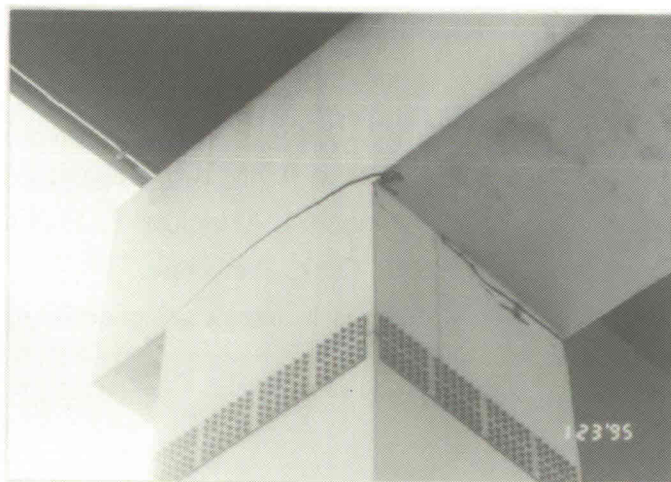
Cracking at the corner between pier and girder on steel rigid-frame bent supporting road bridge: extending nearly 360° (Harbor Highway in Kobe, near No. 1 Jetty at Suma in Nada Ward)
